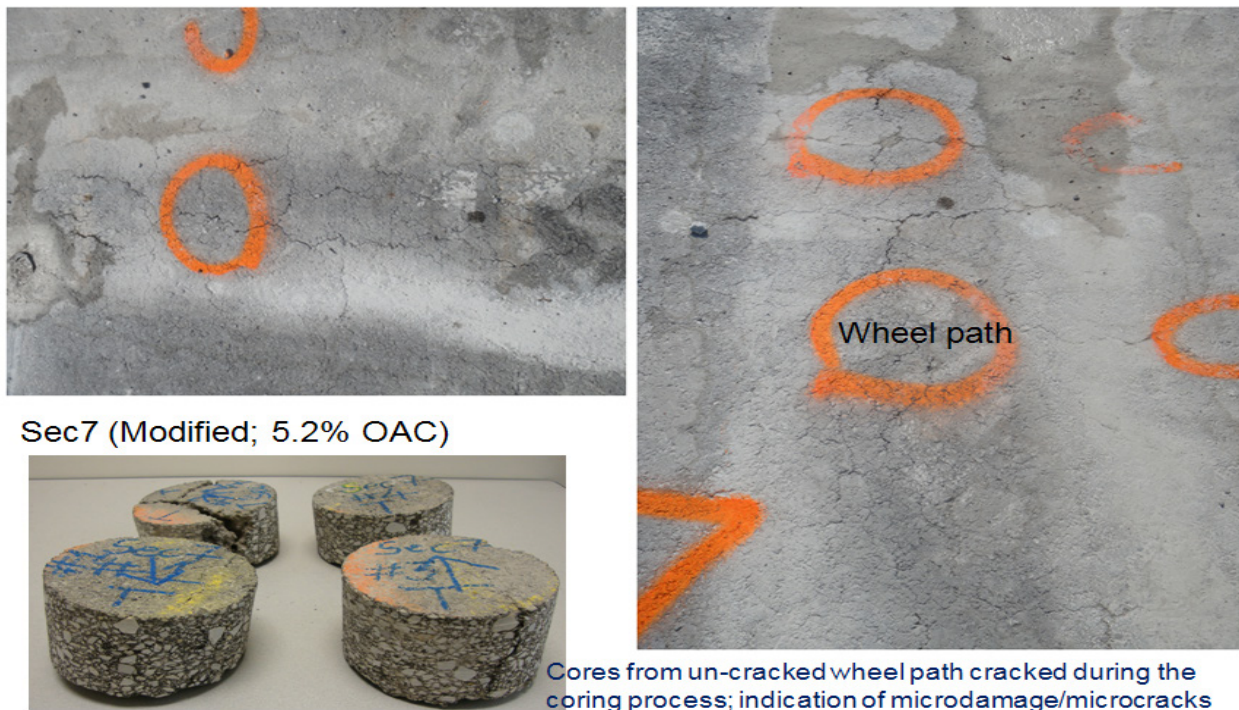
Fatigue Cracking on Modified Section 7.
